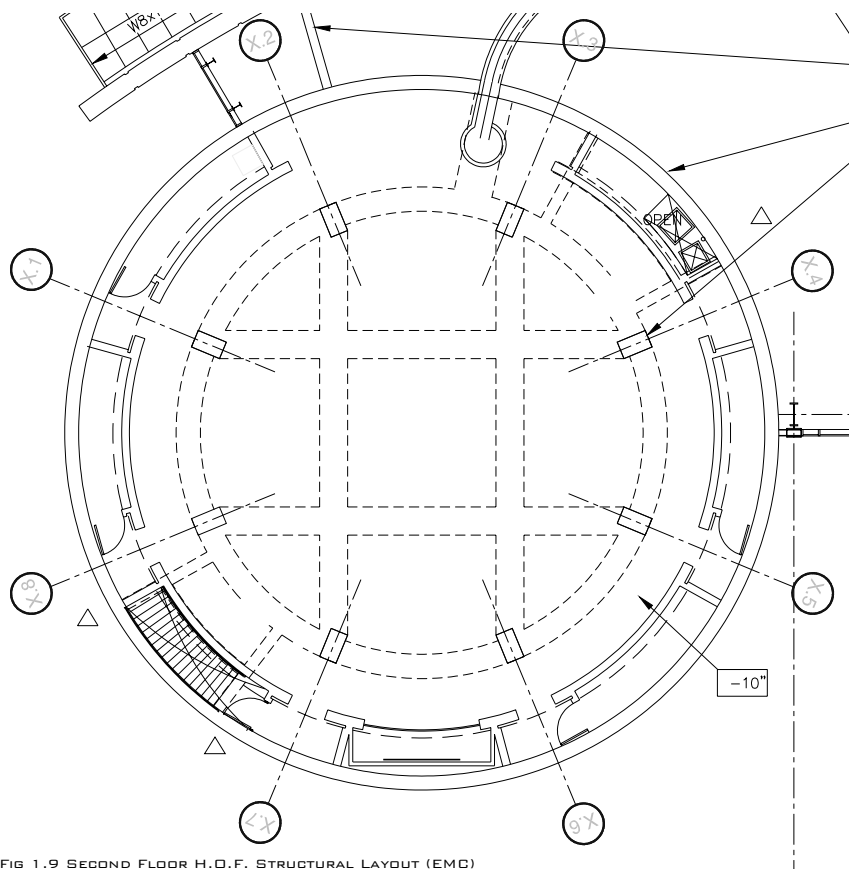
SECOND FLOOR H.O.F. STRUCTURAL LAYOUT (EMC)
